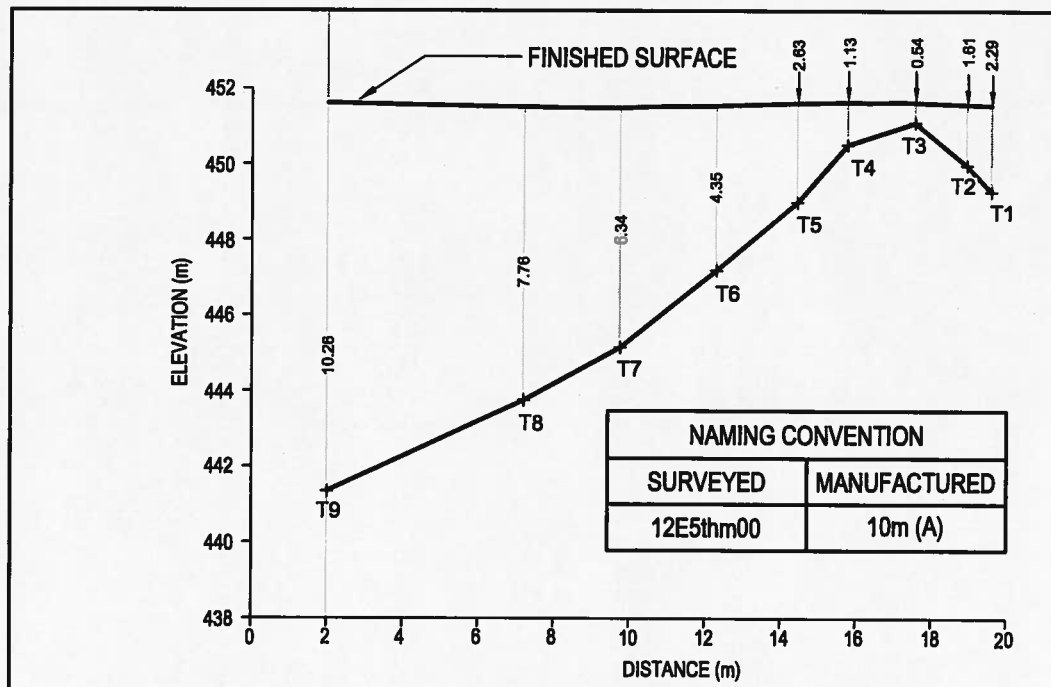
12E5thm00 (10m (A)) - AS MANUFACTURED, PLAN, AND SECTION
